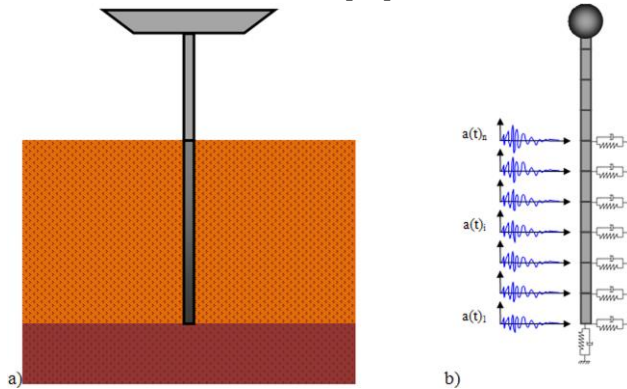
a) the realistic model of pile in the soil, bridge pier and soil, b) the numerical model of pile, bridge pier and implicit modelling of soil action
